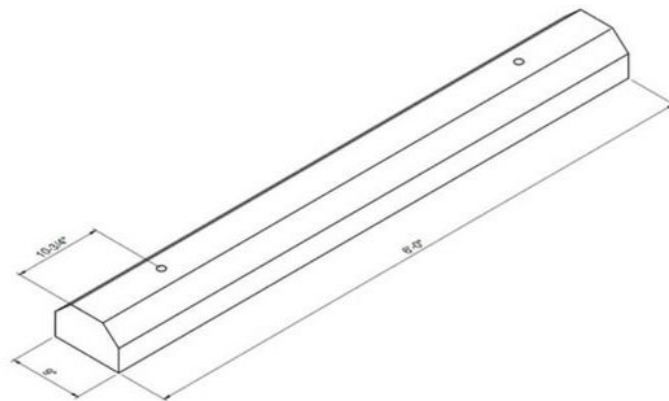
(ii): Example of a standard wheel stop or parking block.
